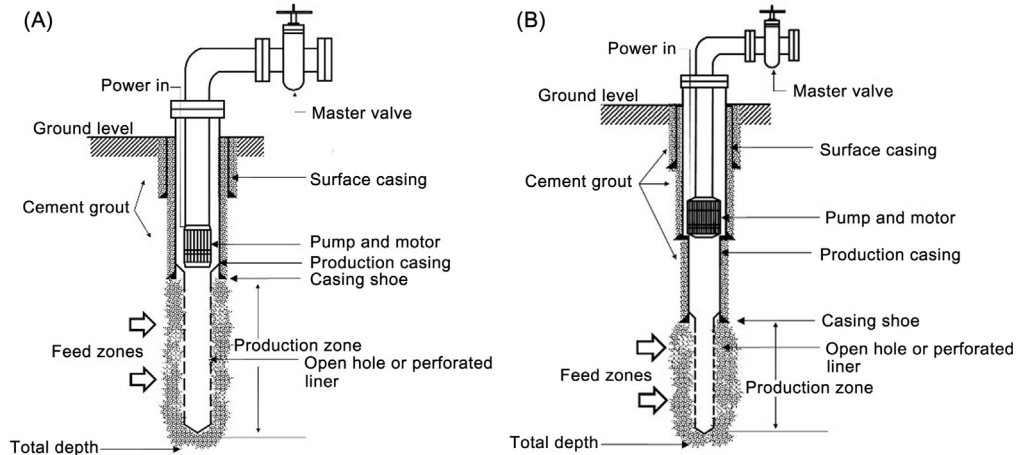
Down-hole pump with motor (A) standard well design and (B) dedicated pumped well design.
